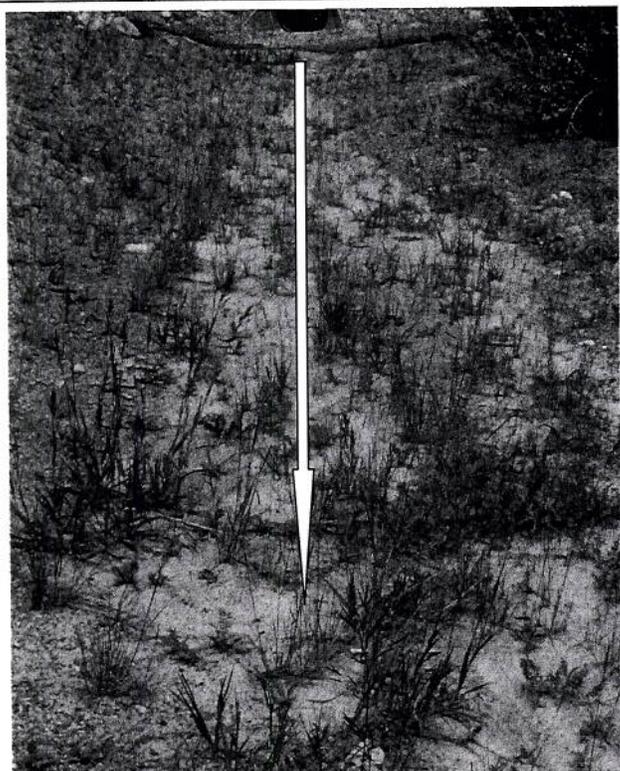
Sediment in the roadside drainage ditch located east of Highway 9 and west of construction site. Ditch ultimately flows to the North Fork of S. Platte River approximately 600 feet to the south.
